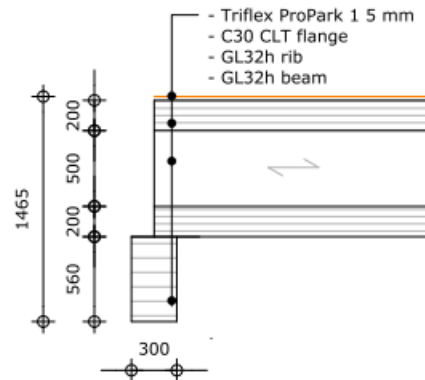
Floor design 2 glulam beam detail cross-section B-B in mm
